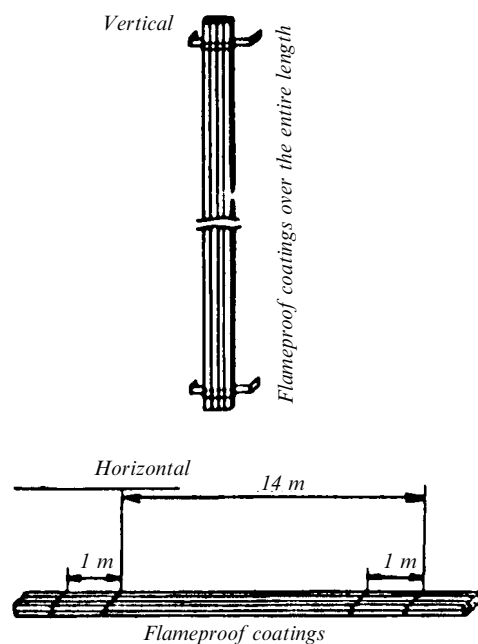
(b) Cable runs protected with flameproof coatings
